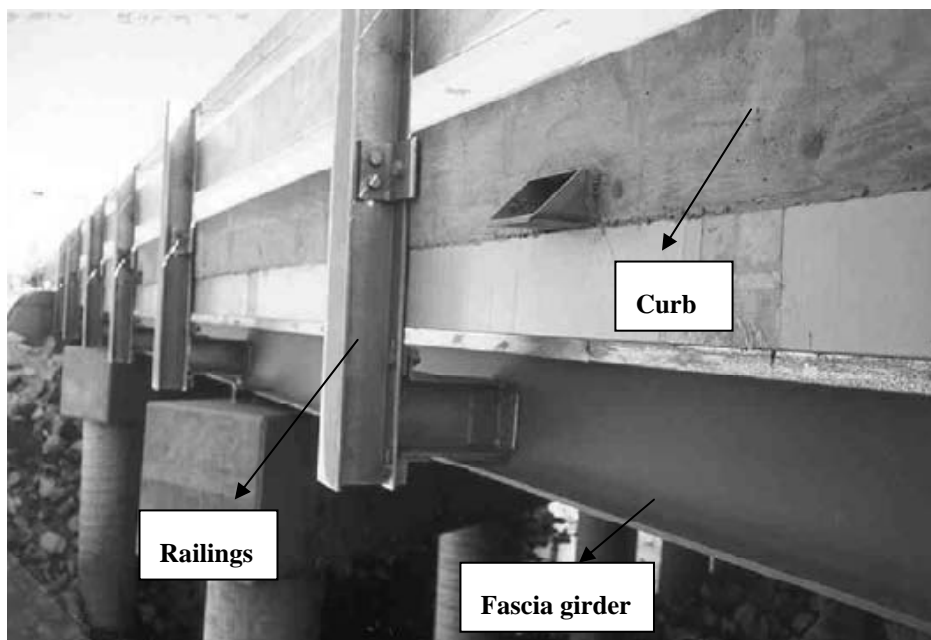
Railings connected to the fascia girders and the curbs built on the FRP deck(NCHRP)
